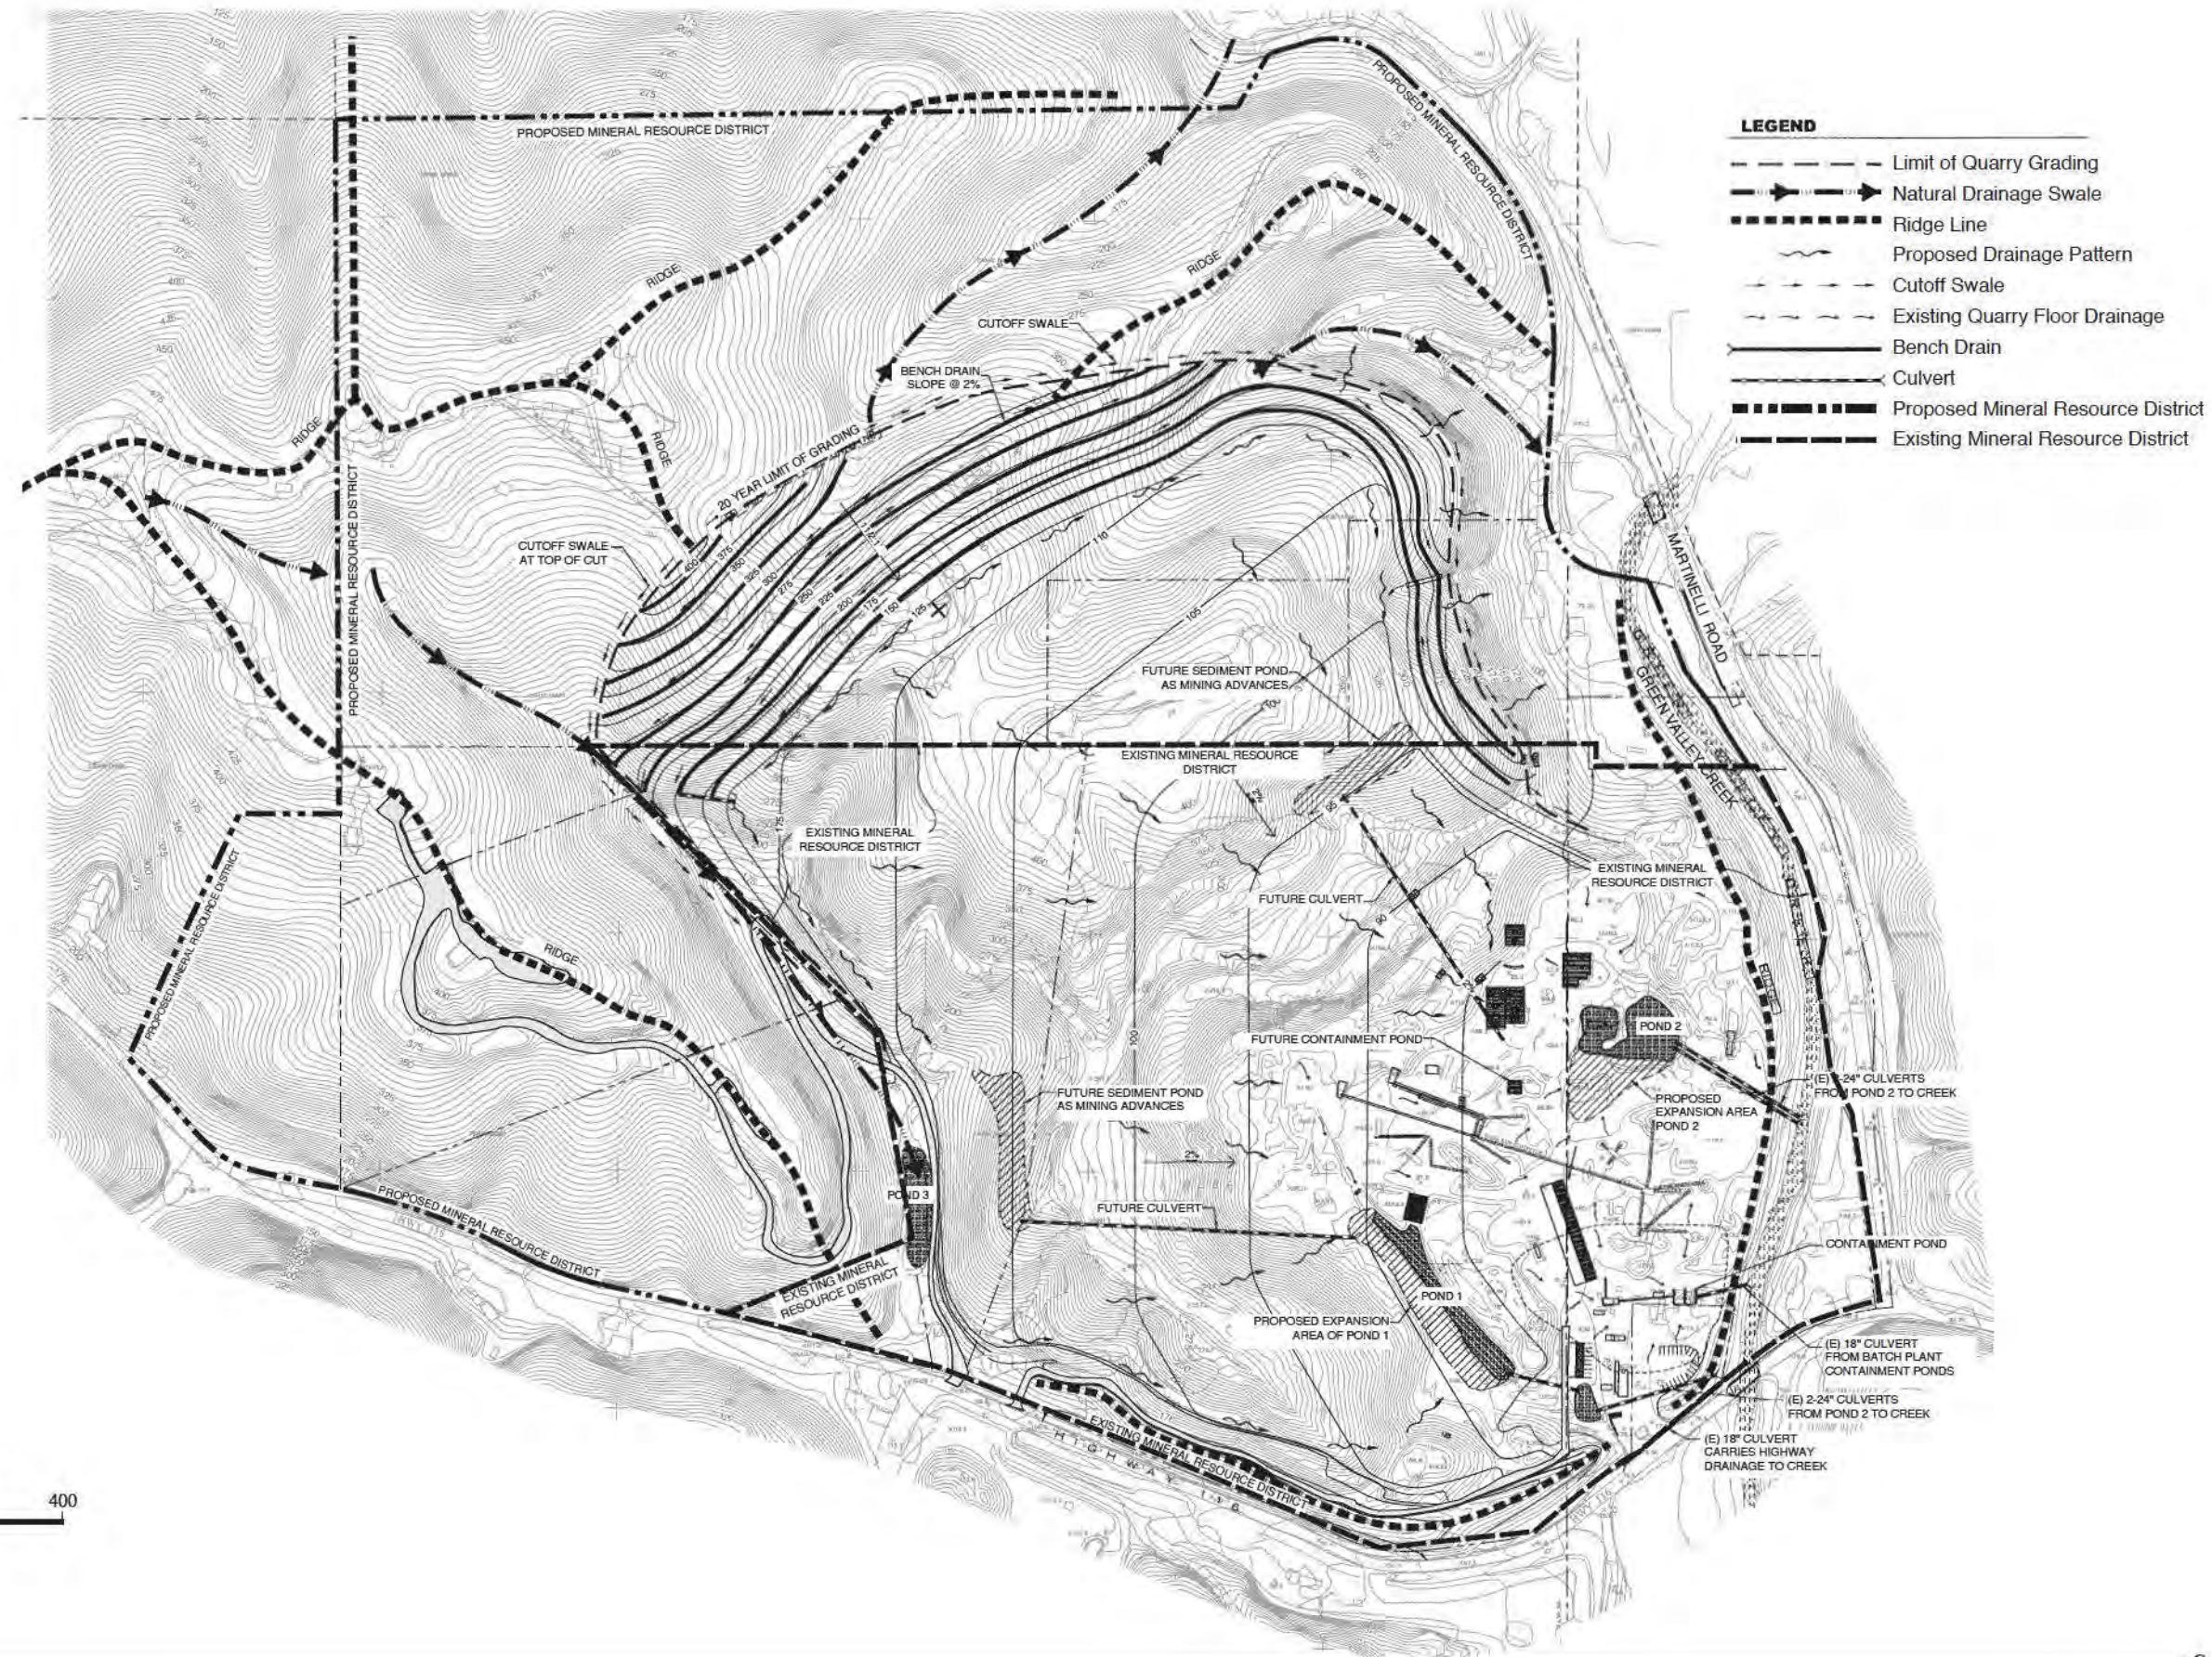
presents proposed site drainage and sediment control for the Northern Expansion option. As under existing conditions, the primary method proposed to be used to control stormwater runoff for the Northern Expansion option are to direct it through sedimentation ponds. Under the Northern Expansion option, the existing sedimentation ponds would be increased in size, and additional ponds would be developed as the mining progresses.
